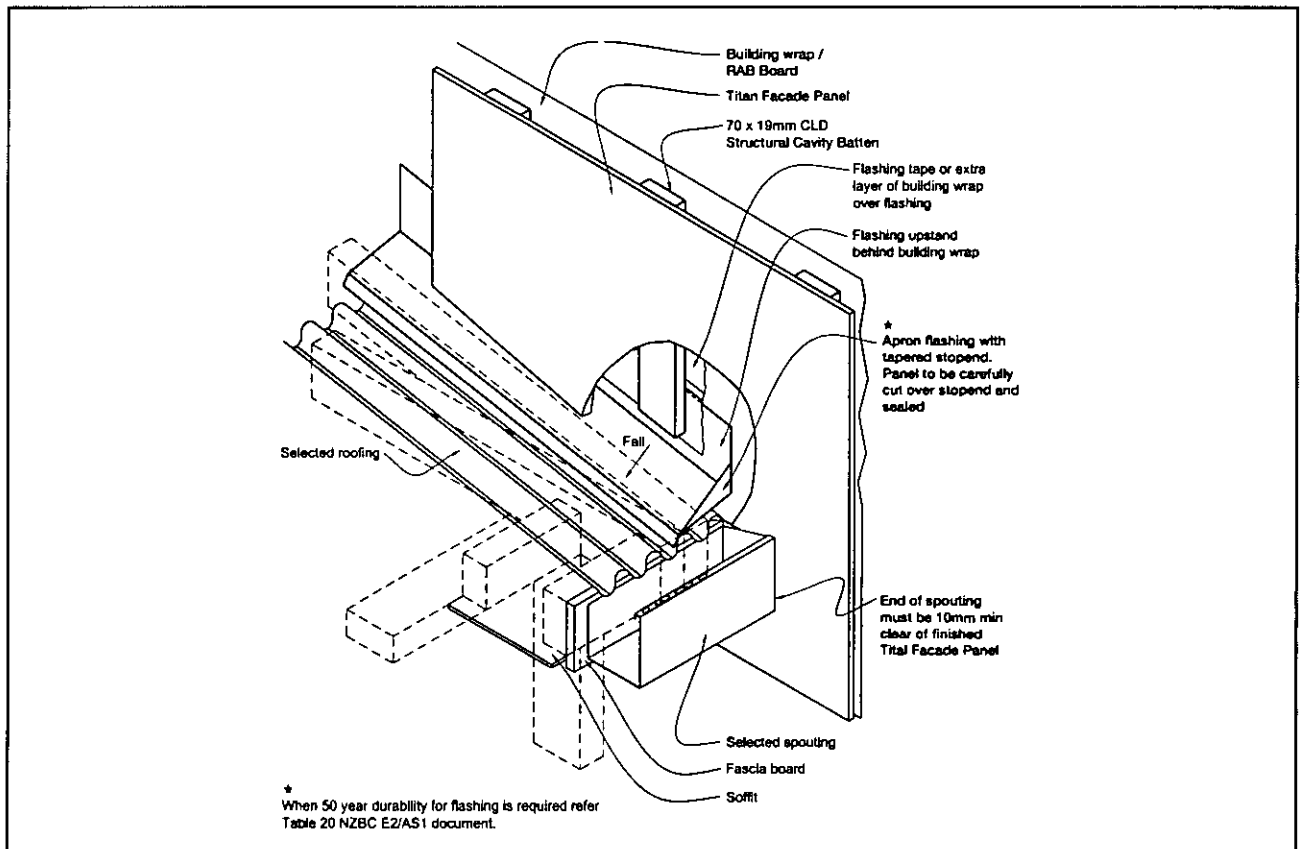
ROOF TO WALL JUNCTION DETAIL
